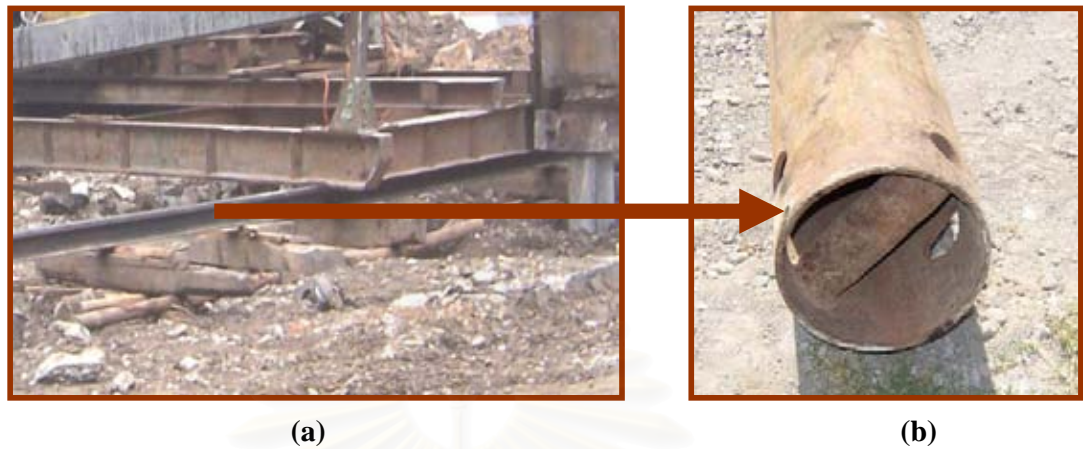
Changing steel rail support (a) with steel pipe support (b)
